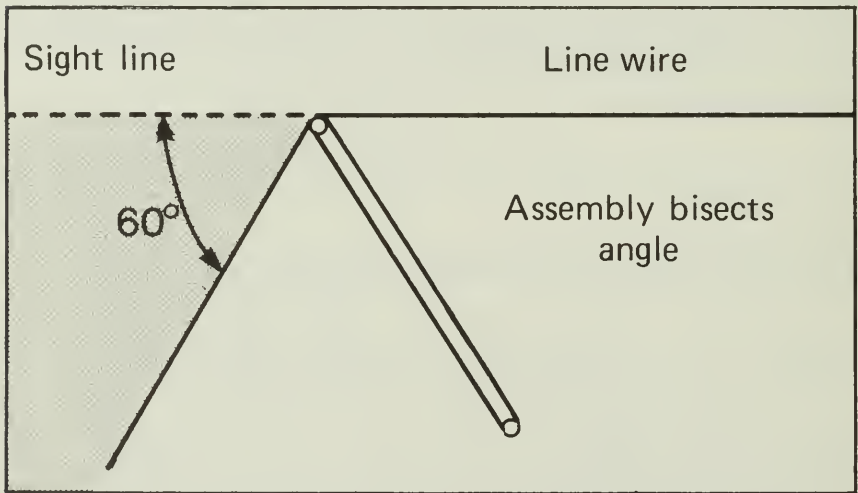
Medium corner brace assembly for change of direction greater than 20° but less than 60°.
